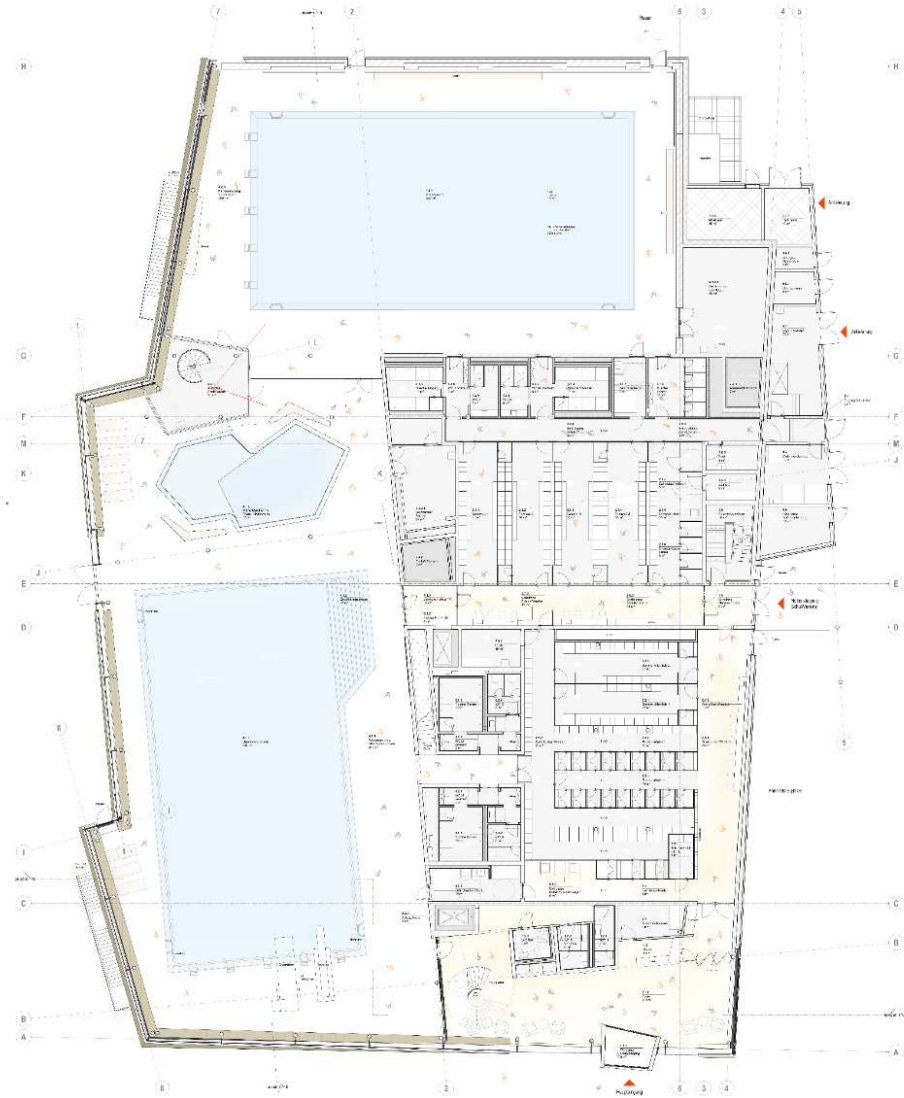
Hallenbad Zuffenhausen Ground floor. Source: Behnisch Architekten, 2023.
